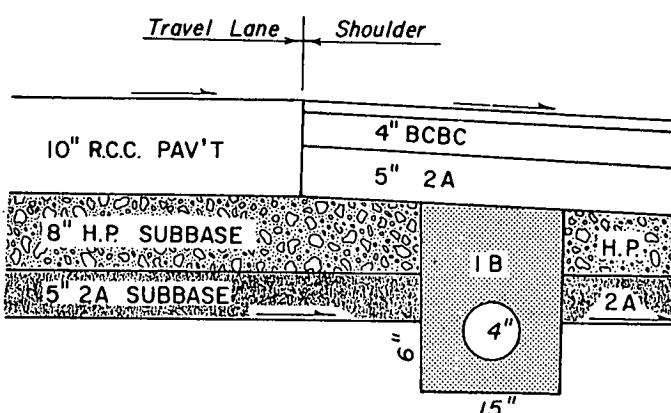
Pavement cross section (high permeability test area) (Pennsylvania) (54).
